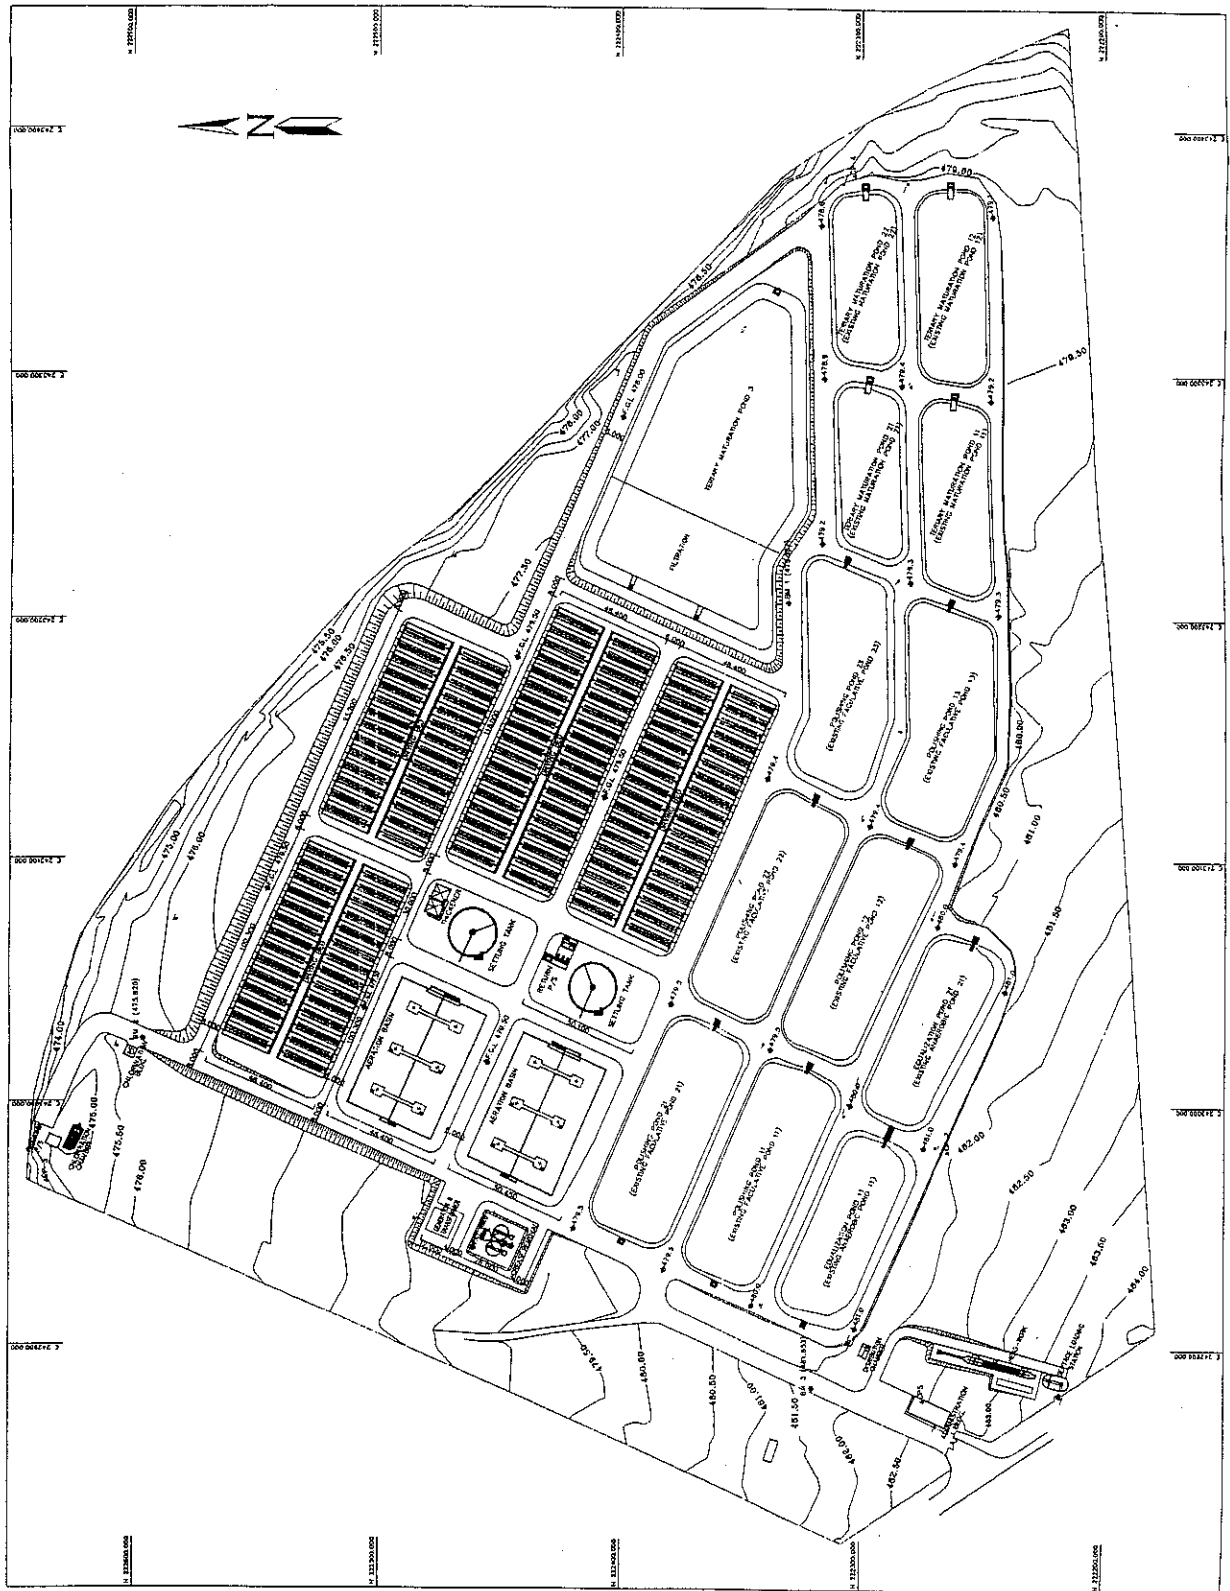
Layout of Proposed Wastewater Treatment Plant - RAMTHA
